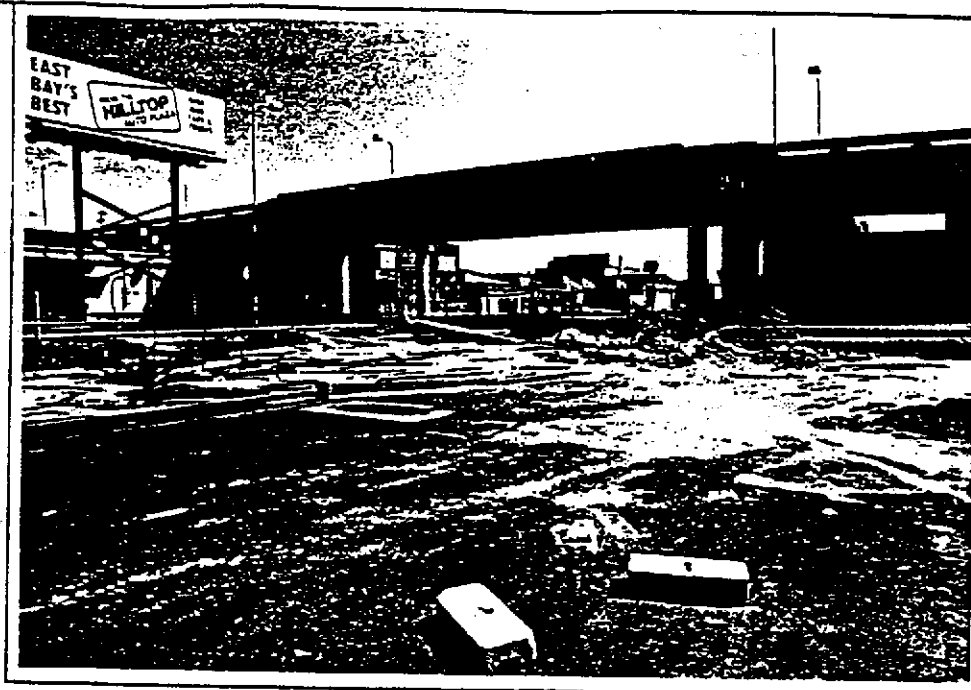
A. SOUTHEAST CORNER OF THE SITE WITH CONSTRUCTION MATERIALS
